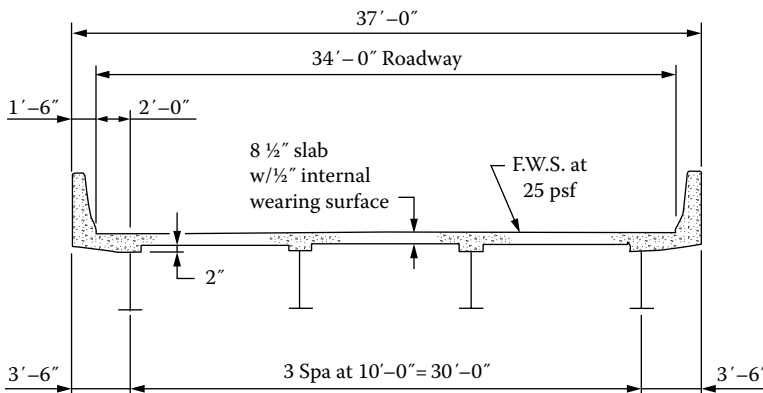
Cross section of the slab–steel girder bridge.
